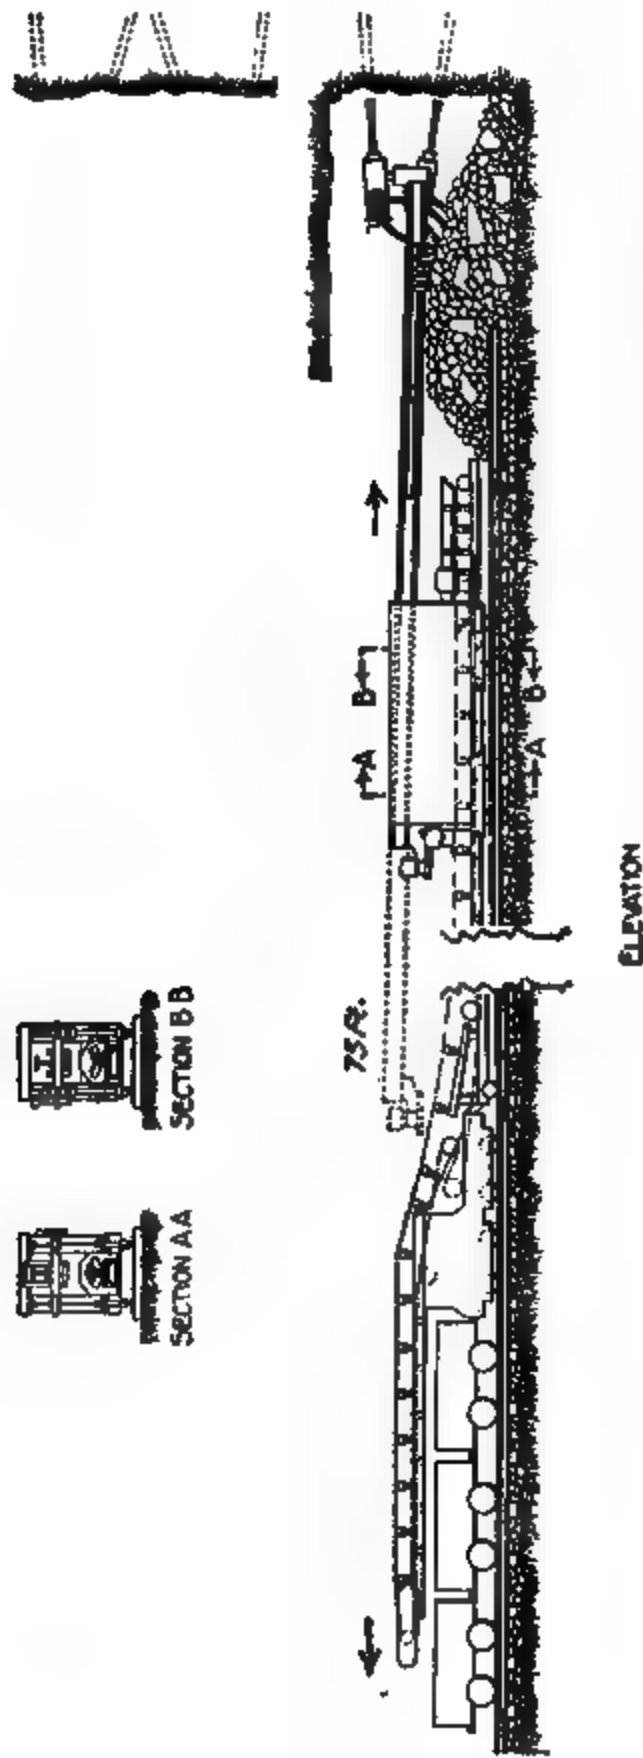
More complicated carriage provides for mechanical operation in extending and adjusting bar and equipped with mechanical mucking device.
